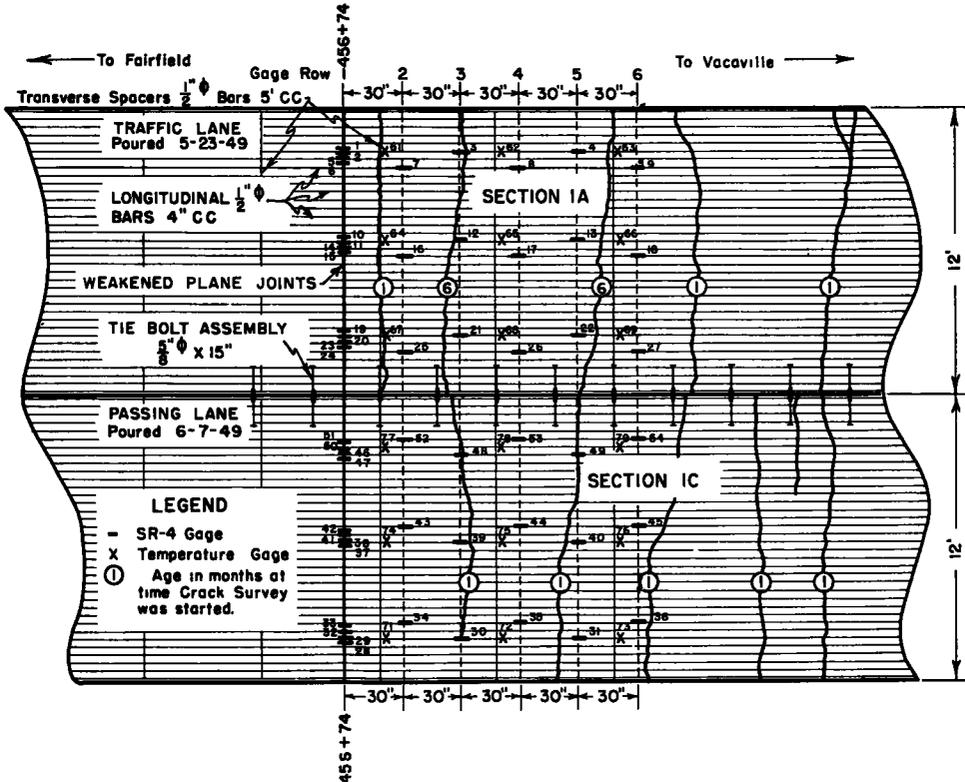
Plan of Placement of SR-4 Gages on Steel and Crack Formation—Sections 1-A and 1-C
